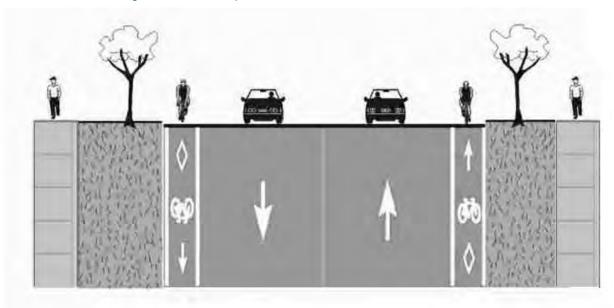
Example of a Road Cross Section with Bike Lane
